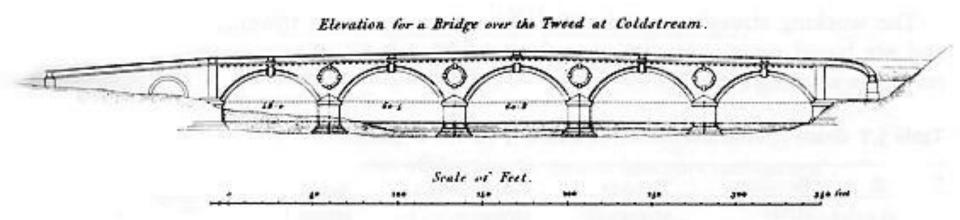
Elevation of masonry Bridge over the Tweed at Coldstream, 1866 (Irwin and Sibbald, 1983)
